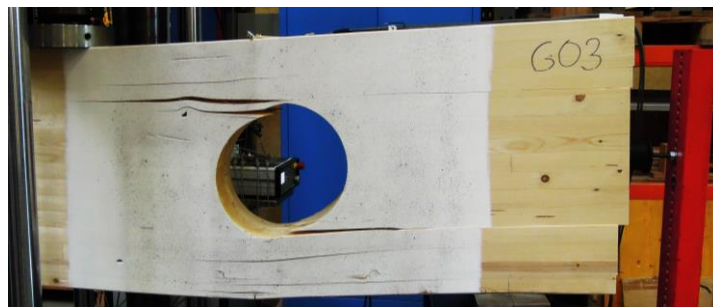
Multiple cracks around the opening, due to multiple shear failures, bending failure in net cross section of test specimen G03
